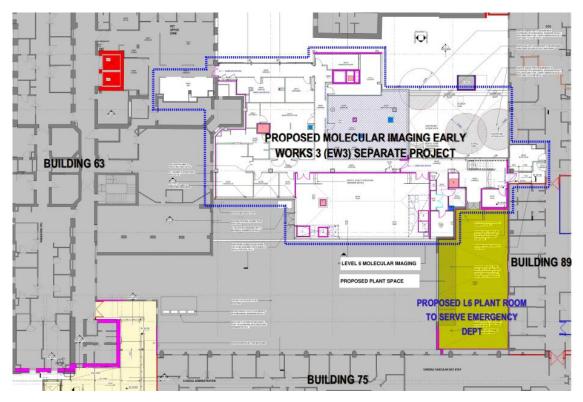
Proposed floor plan detailing the location of the Level 6 plant room
